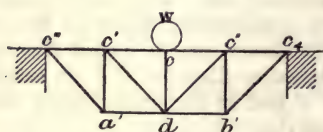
Parallel Strut-Girder.—Lower end bays removed.
